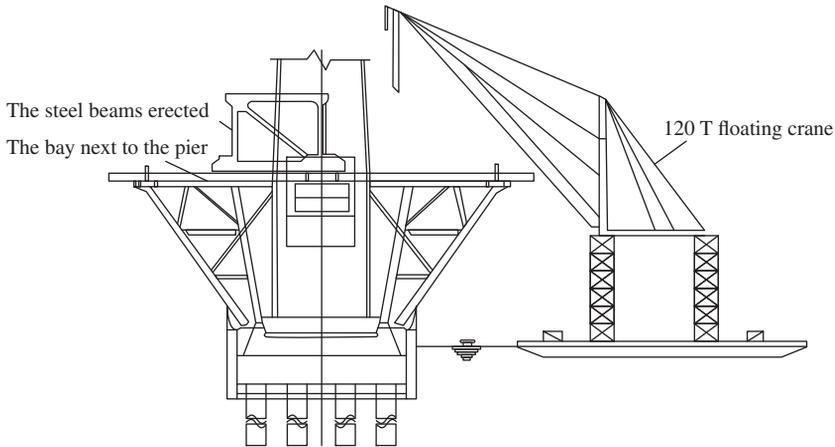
Inter-panel steel truss segment erection over pier top. (From Hu, H.Z., *Bridge Constr.*, 3, 1–4, 2007.)
